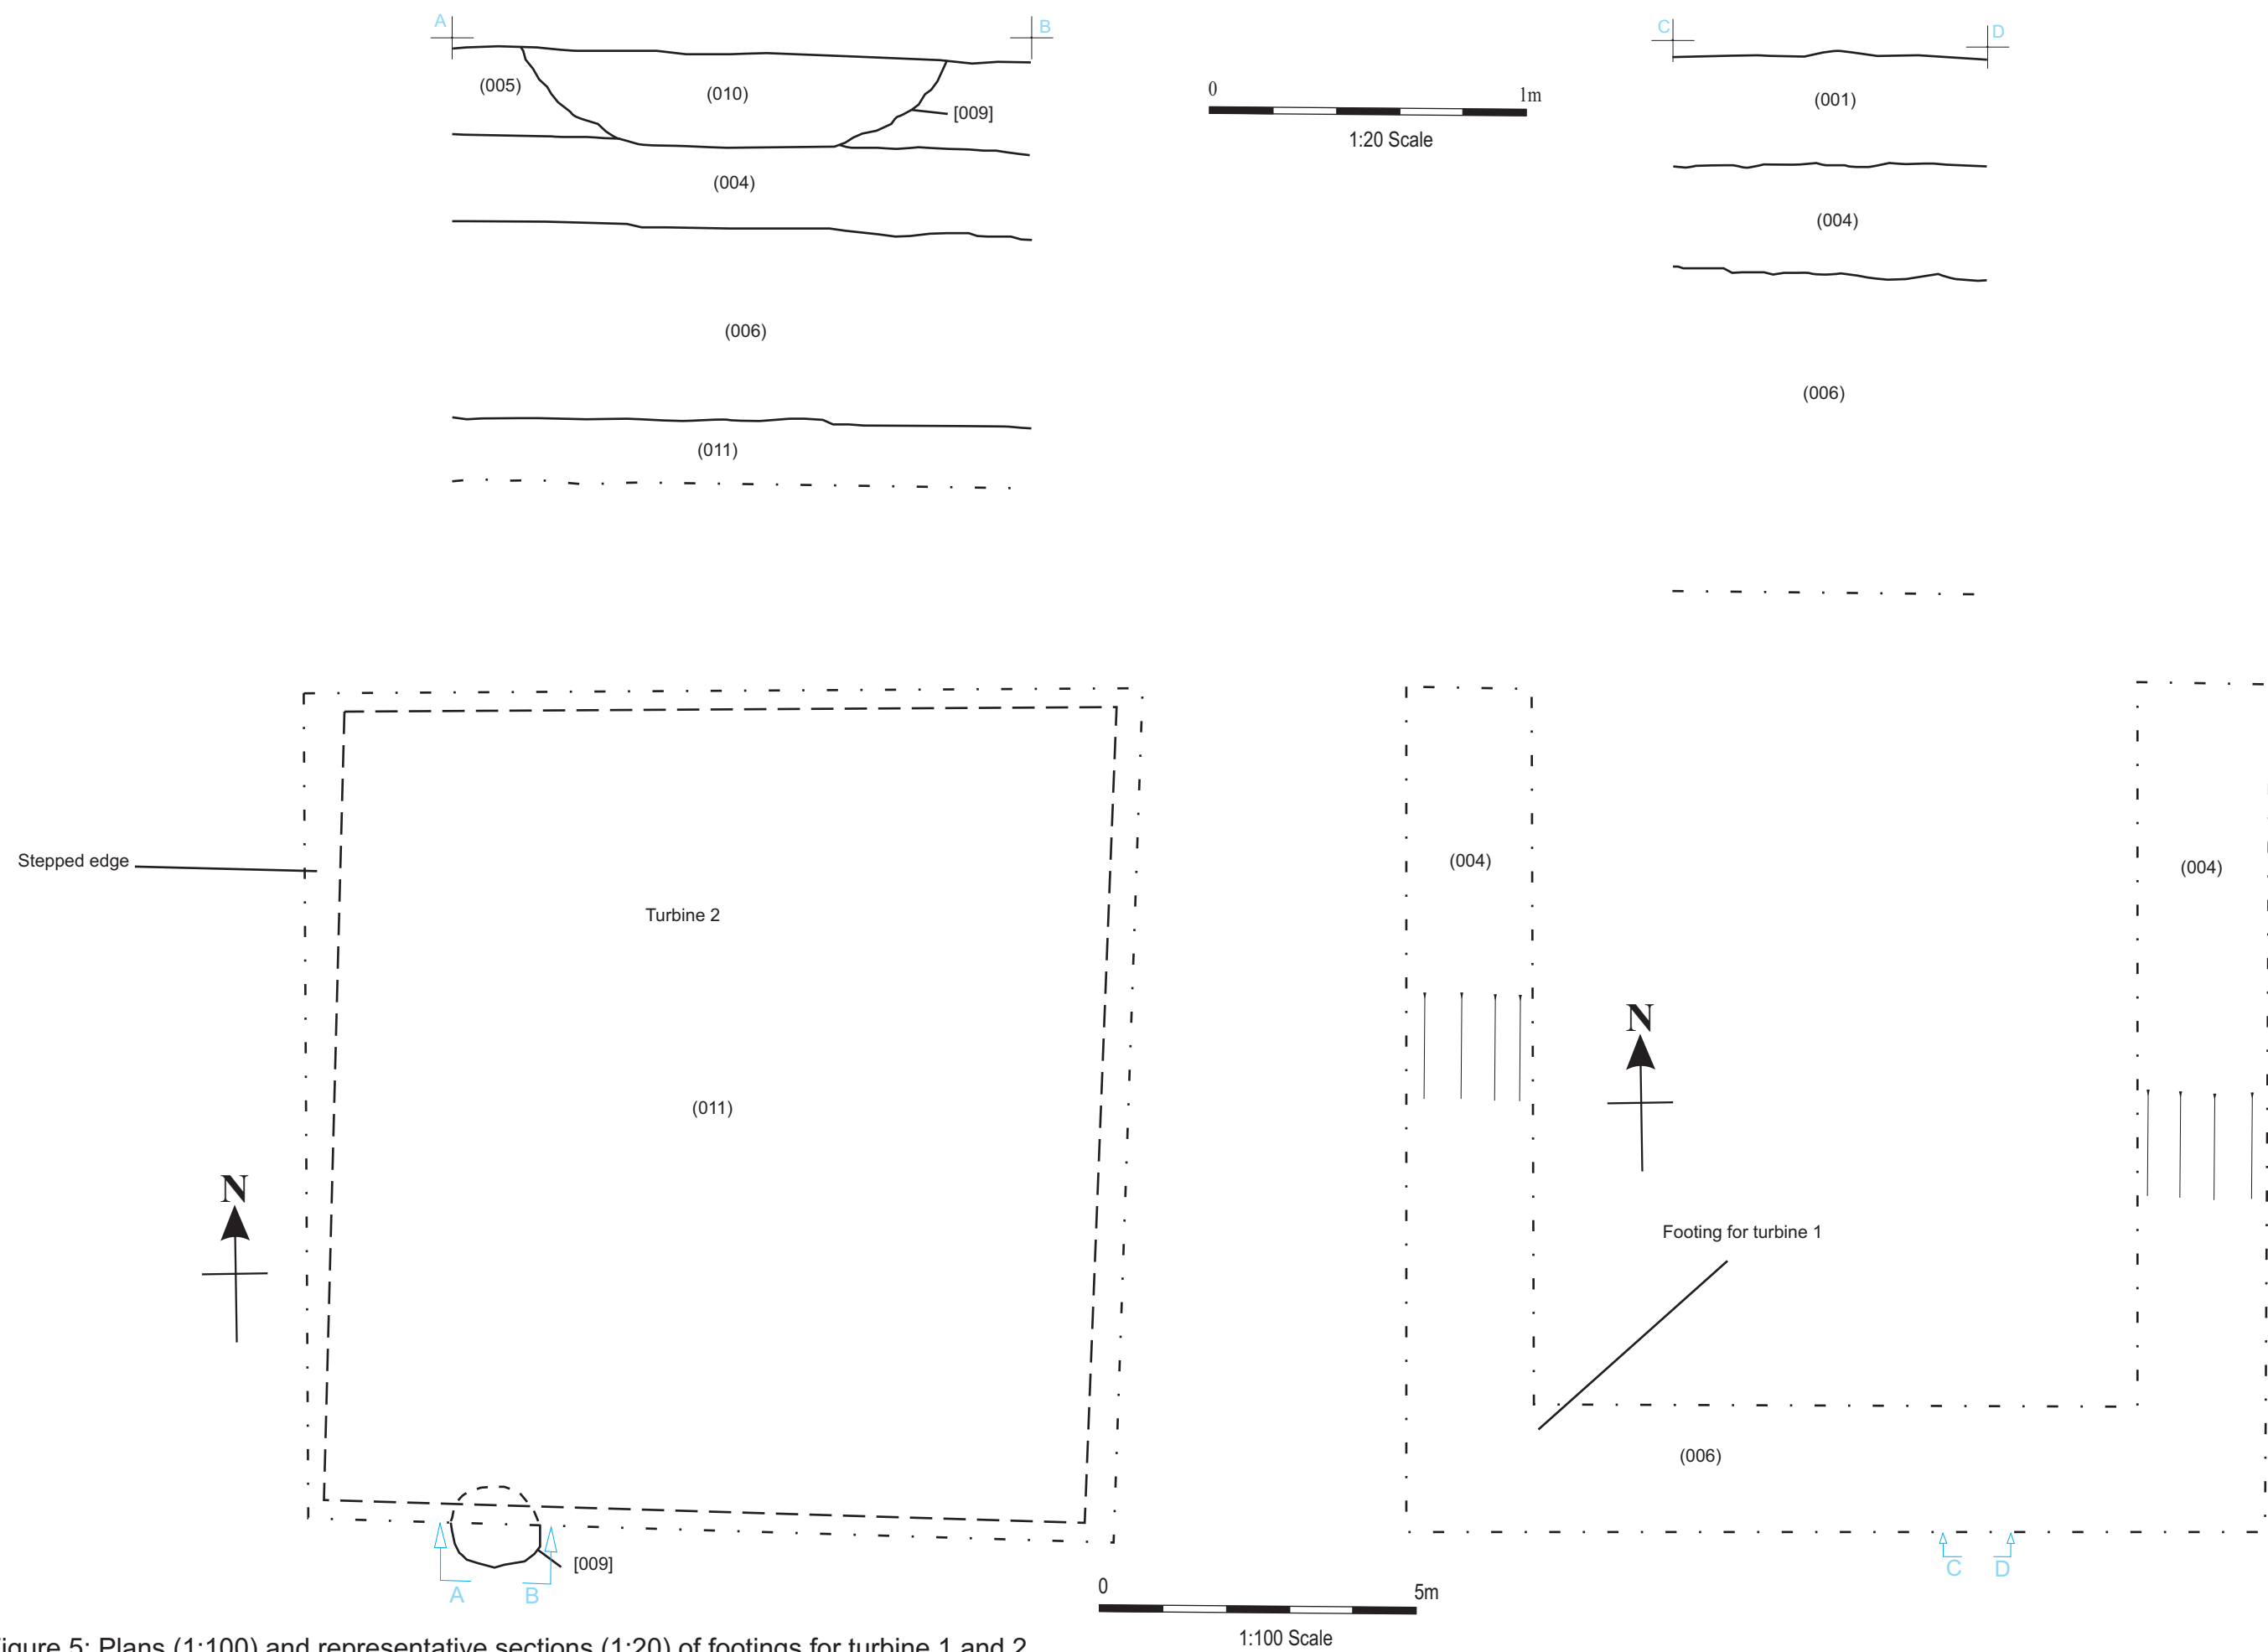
Plans (1:100) and representative sections (1:20) of footings for turbine 1 and 2.
